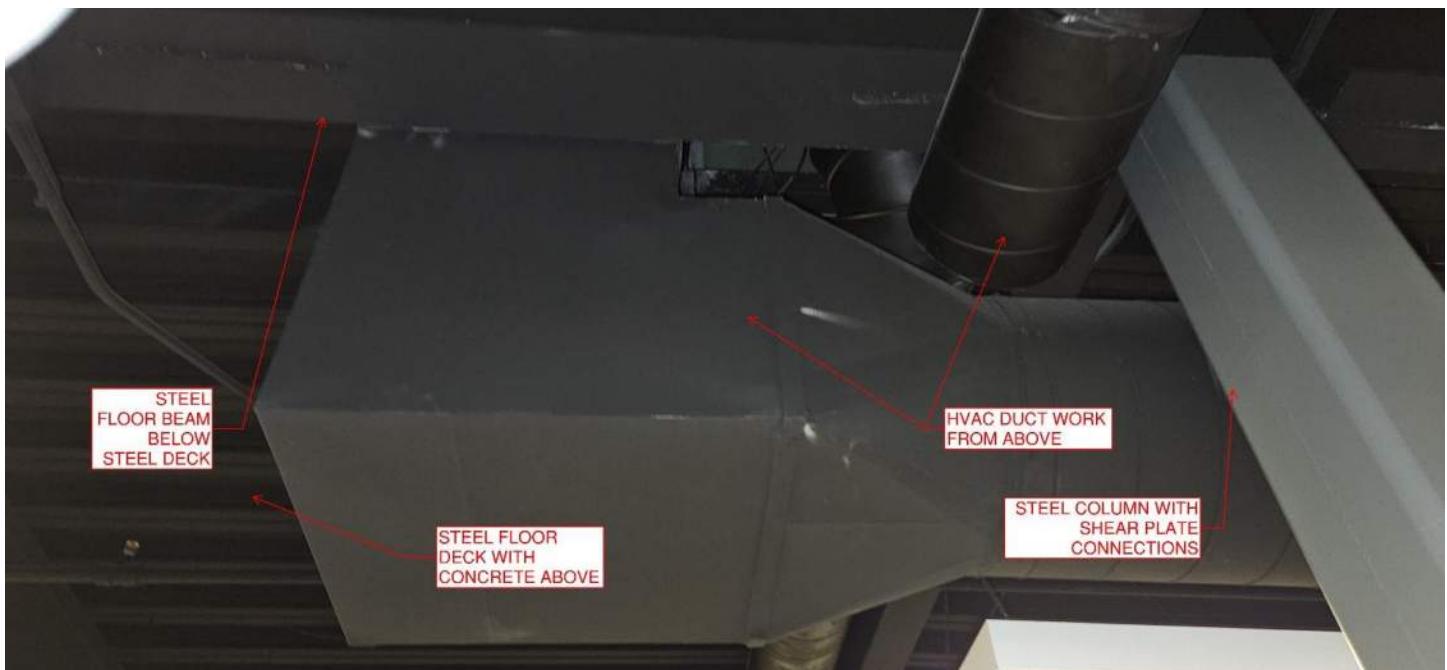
HVAC DUCTWORK FROM ABOVE
